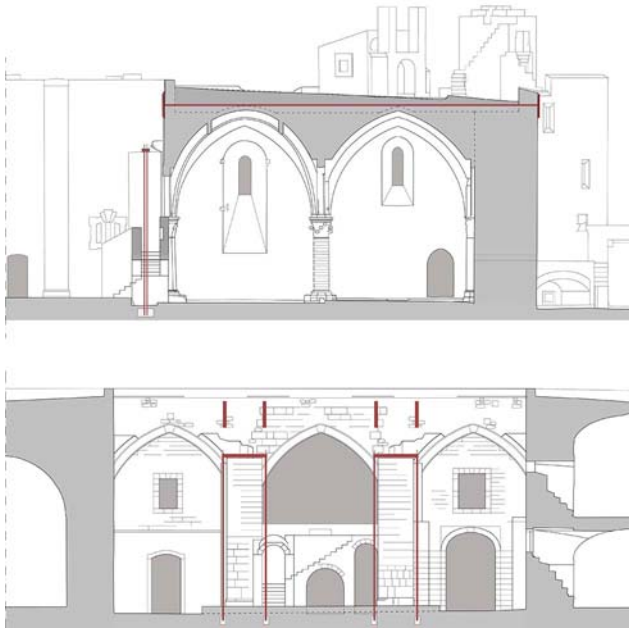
Elevation and transverse section of the proposed design solution with the vertical steel tendons on the sides of each buttress and the upper tie-rods anchoring the courtyard façade.
